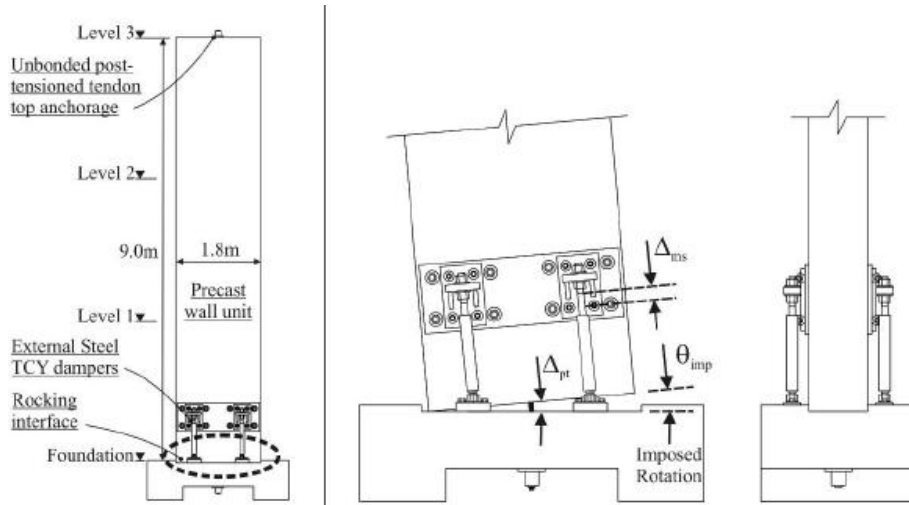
Post Tensioned Precast Rocking Wall System with Externally Mounted Mild Steel Dissipators (left) and Controlled Rocking (right) [23]
